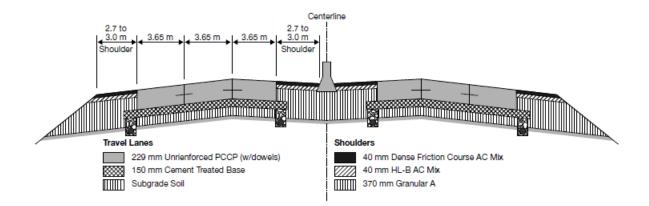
Typical slab structure of Highway 427 in Canada.
